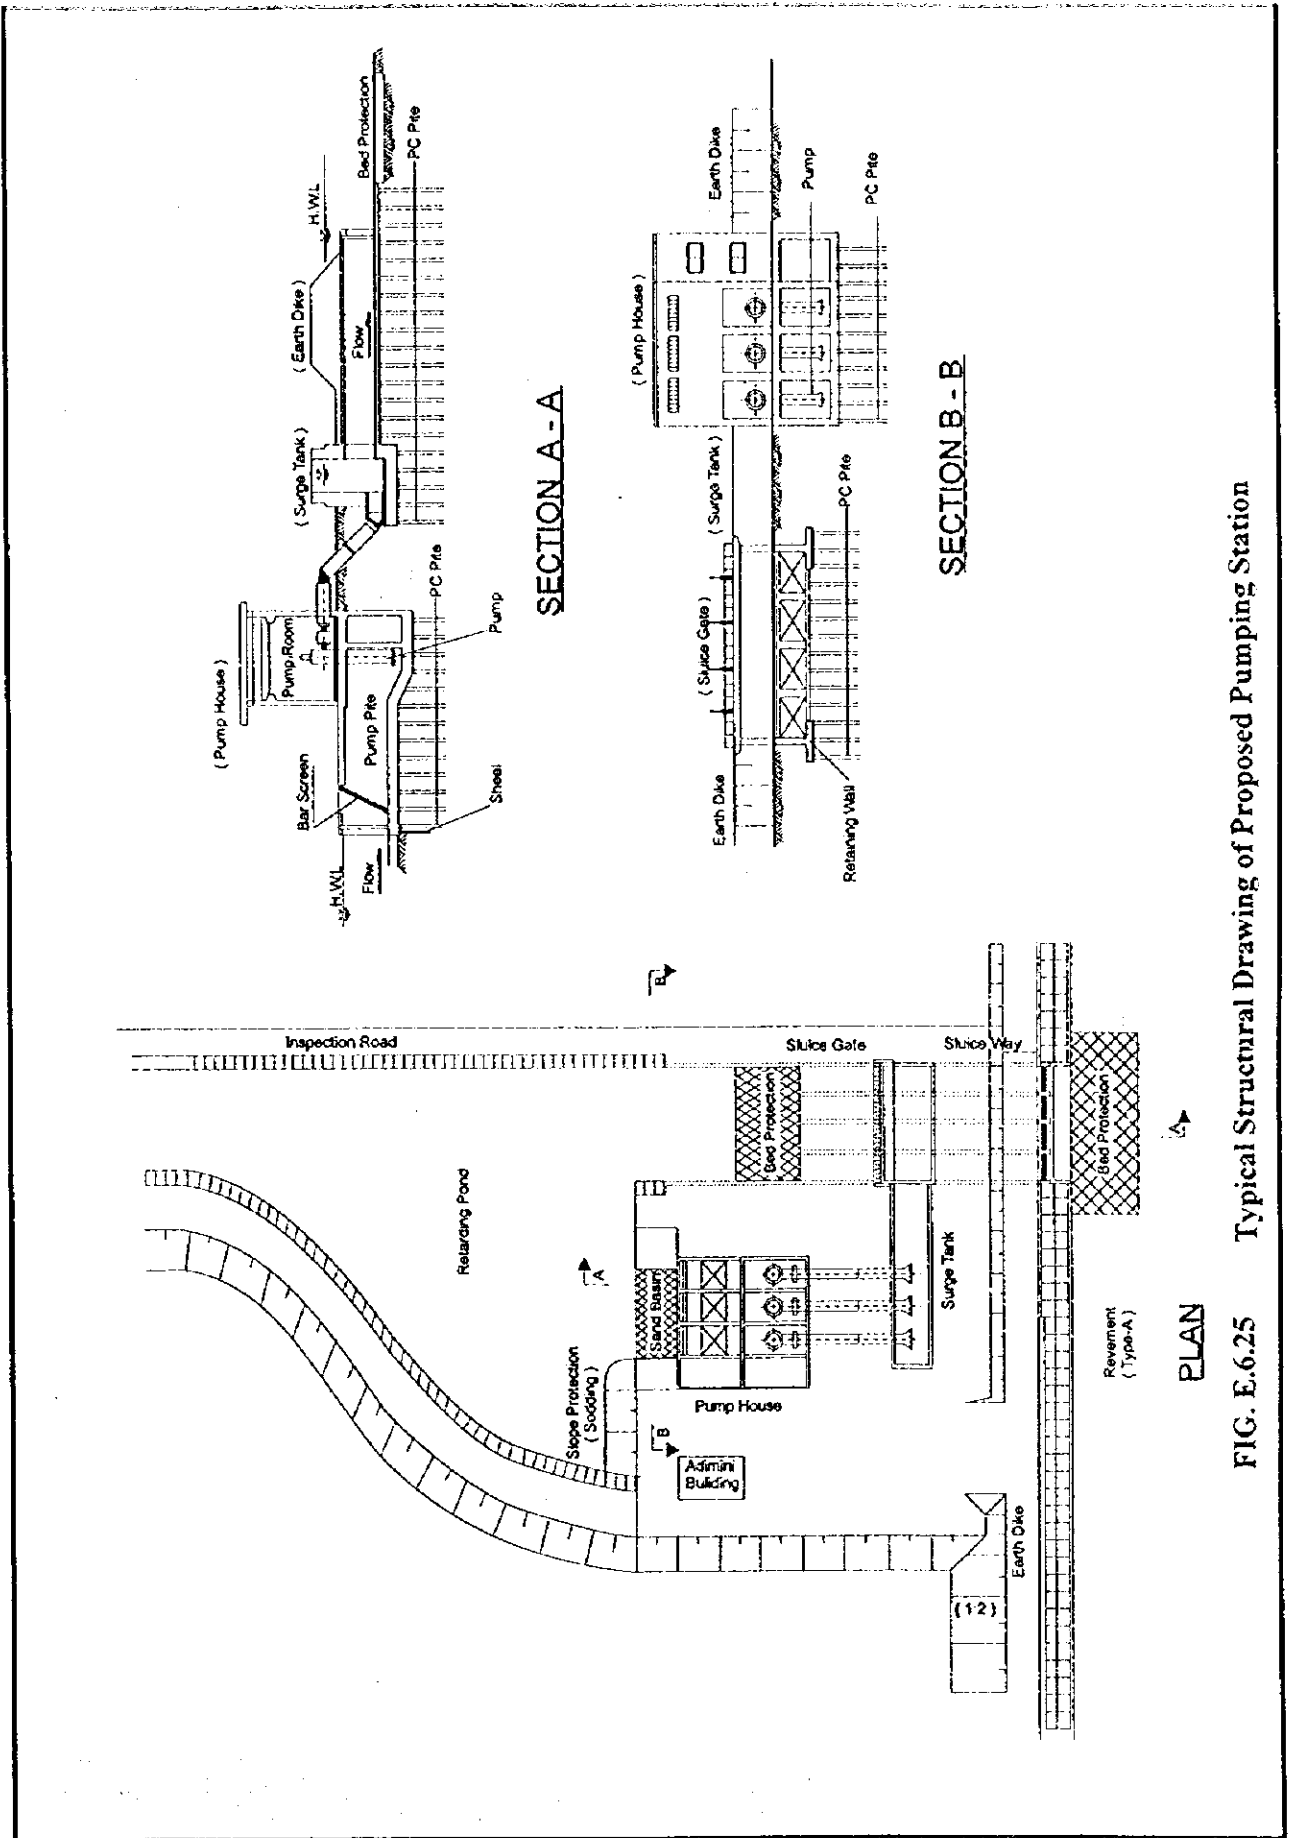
Typical Structural Drawing of Proposed Pumping Station
